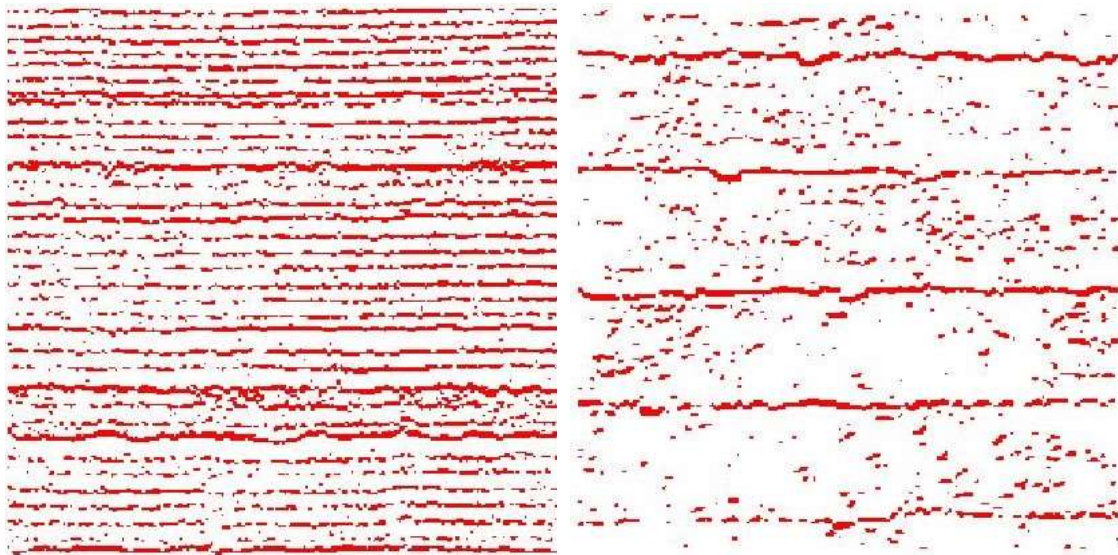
Discontinuities left on rammed earth wall due to construction technology
